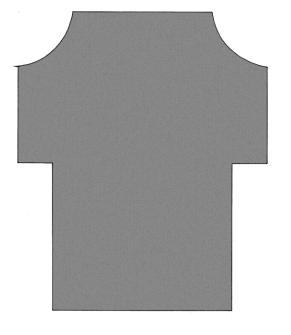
Cross section of upper floor joist number 5. The height was 140 mm and the maximum width 117 mm.
